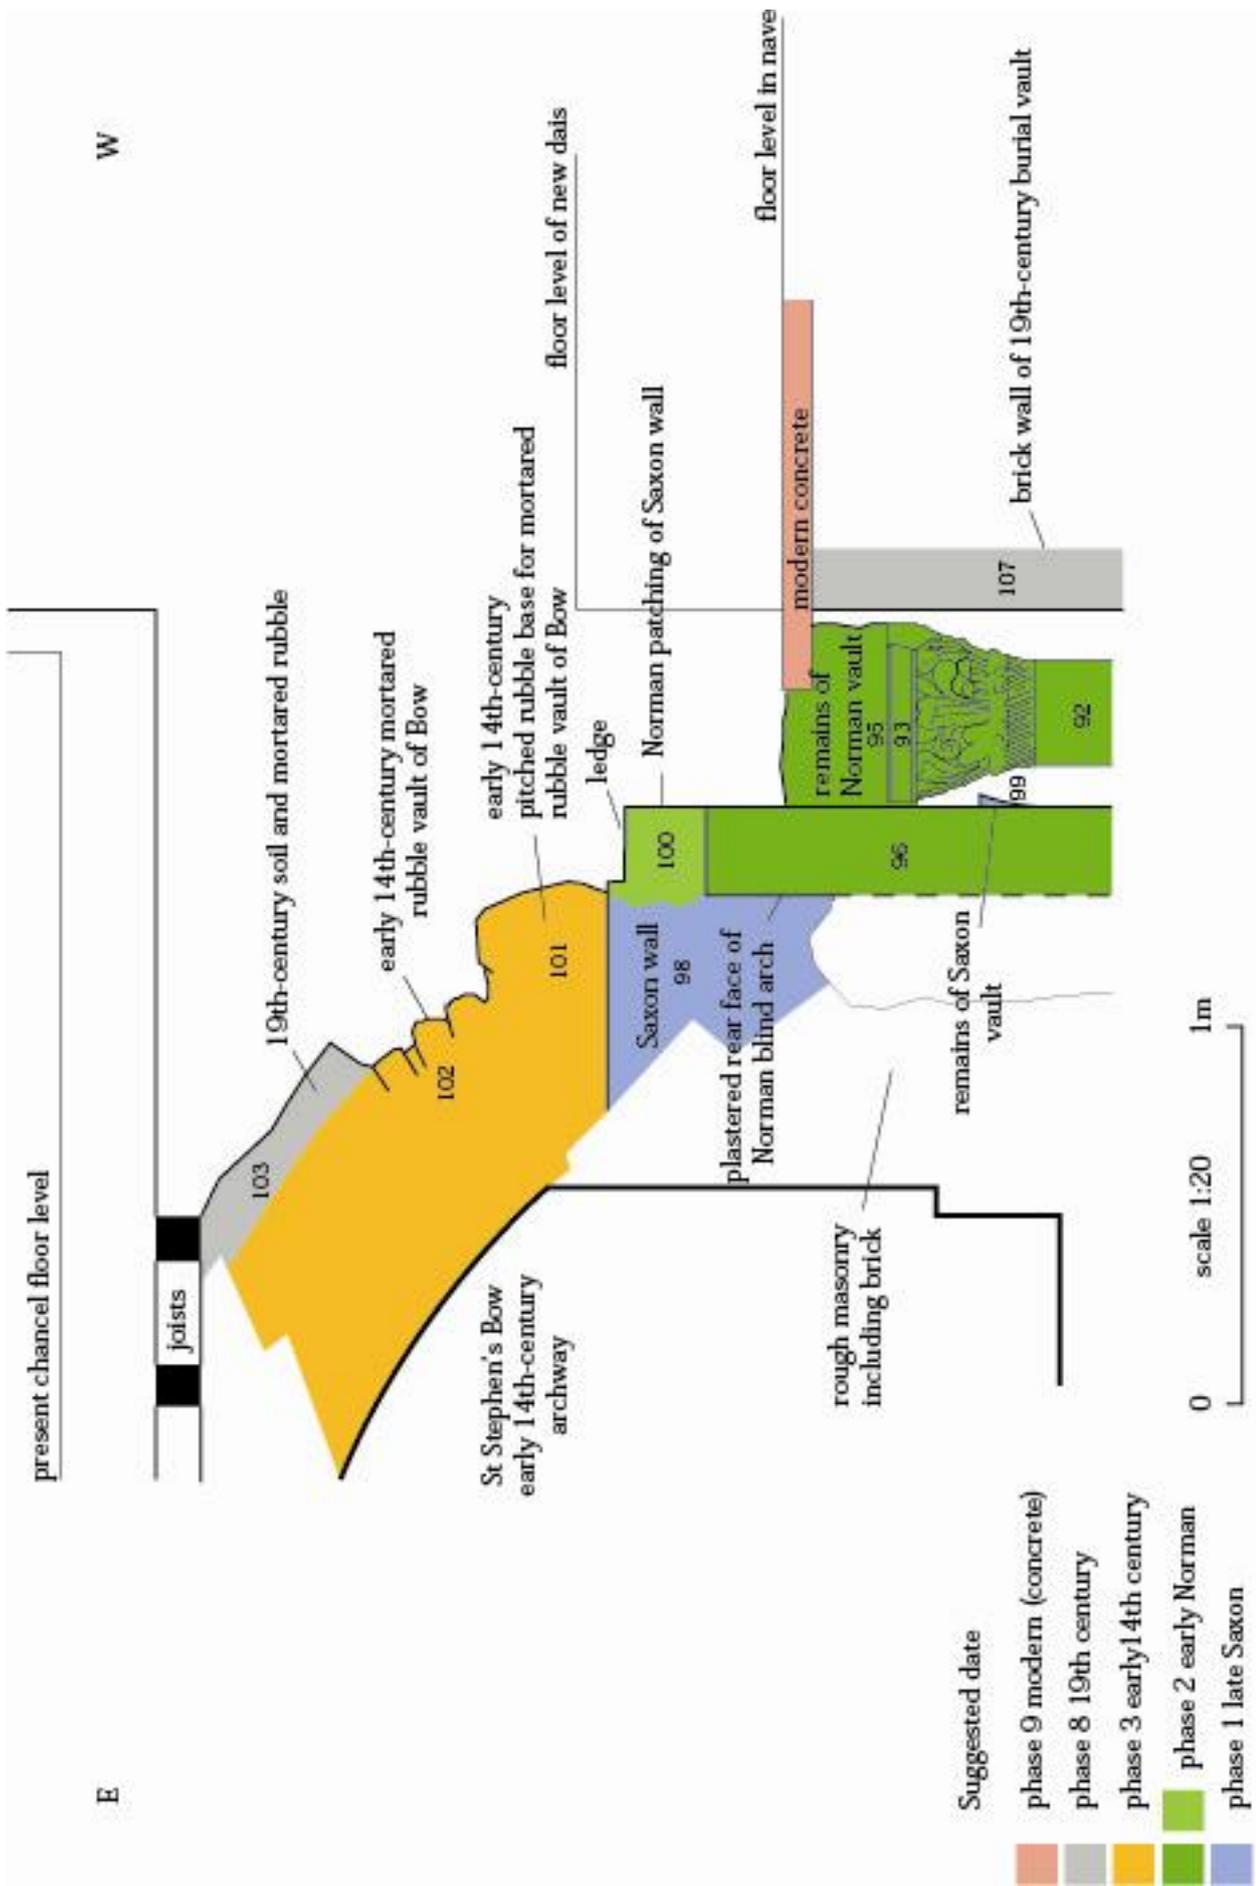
Section through masonry excavated beneath chancel arch, looking south.
